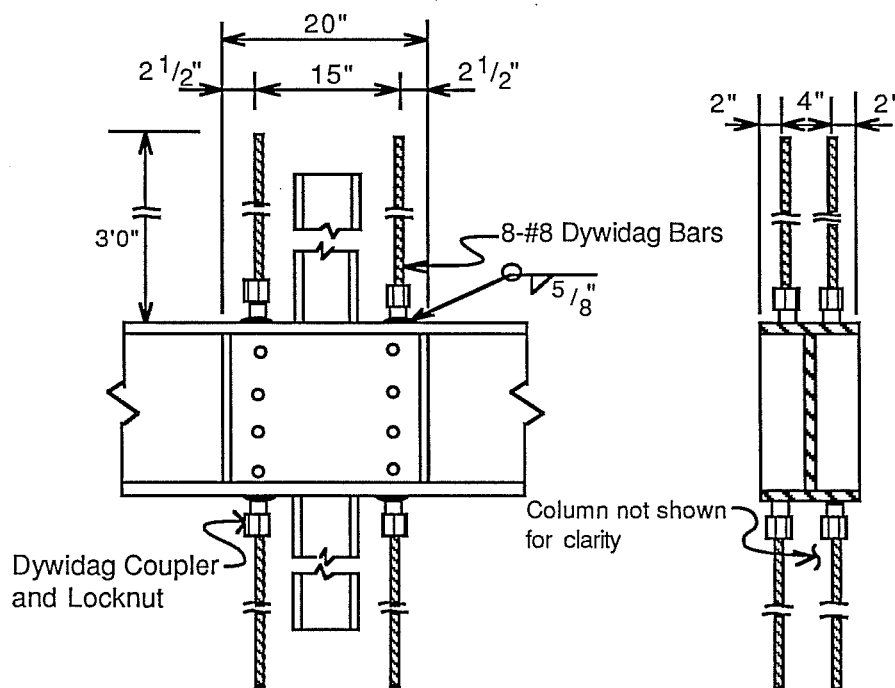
Specimen 15: Face Bearing Plates and Column
